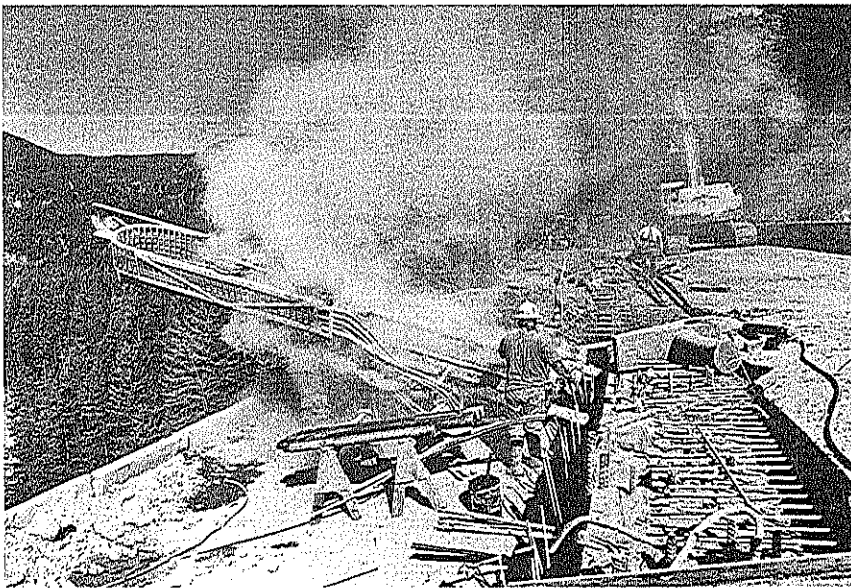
Goat Lick Slide. Drilling for a tieback anchor.
